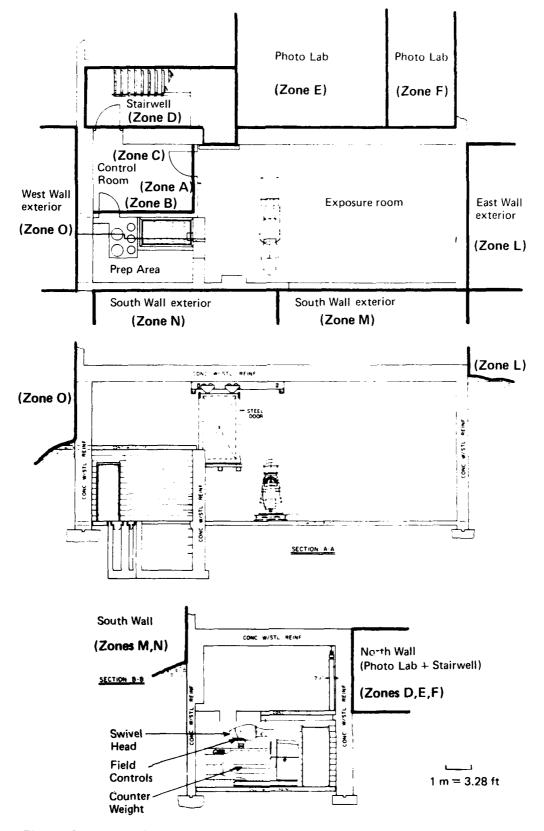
Plan of AFRRI's Standards Lab, showing location of adjacent office spaces and zones used in initial survey
